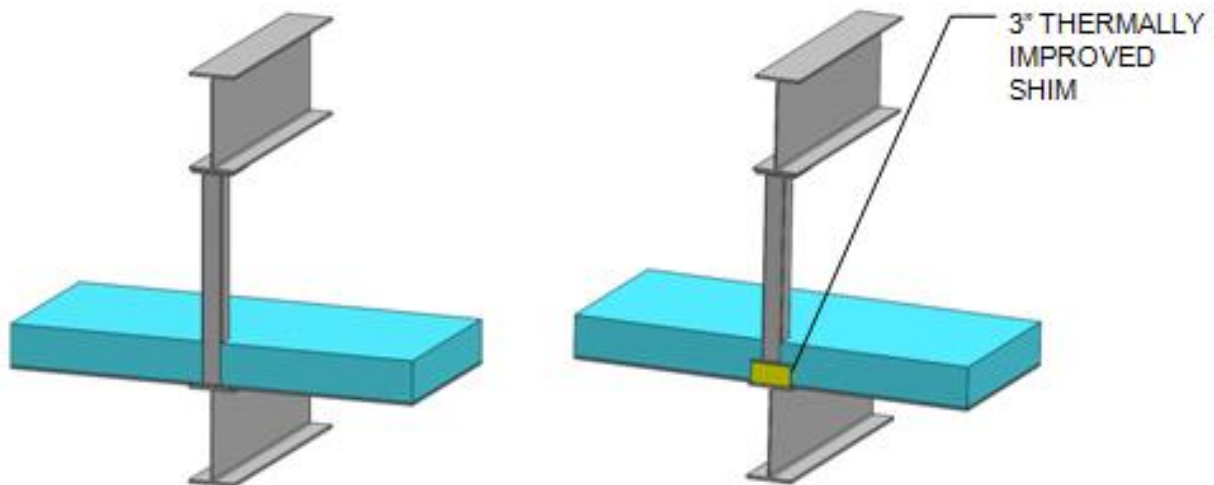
Unmitigated (left) and Mitigated (right) Roof Post Typical Detail
